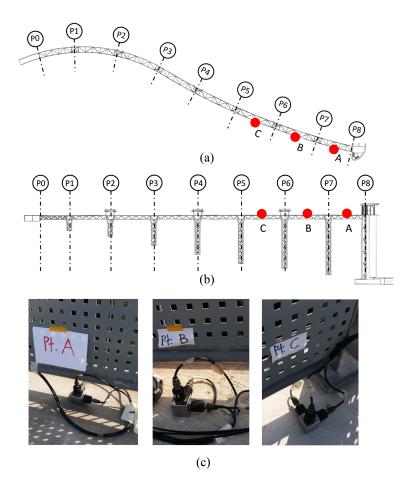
Configuration and photos of accelerometers: (a) plan view; (b) elevation view; (c) accelerometers installed at location A-C
